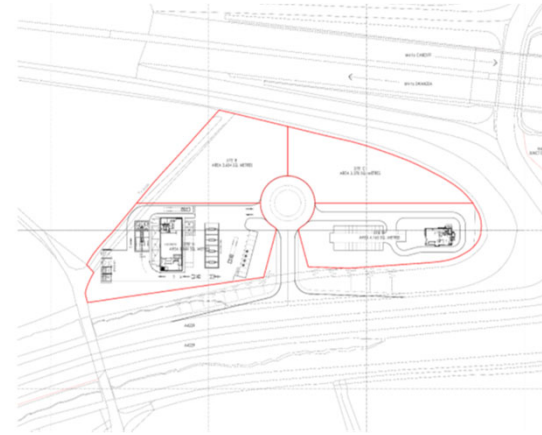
Detailed Petrol Filling Station and Fast Food outlet layouts imported
